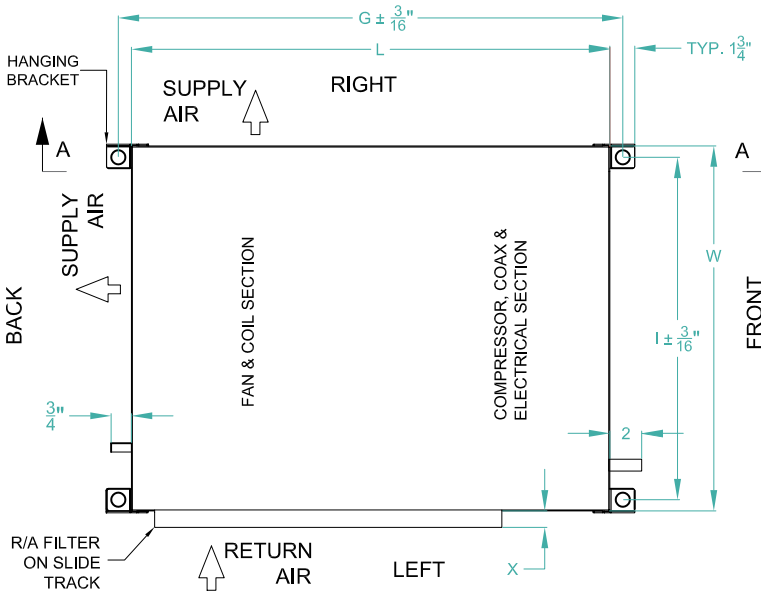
TOP PLAN VIEW (COMMON VIEW)
